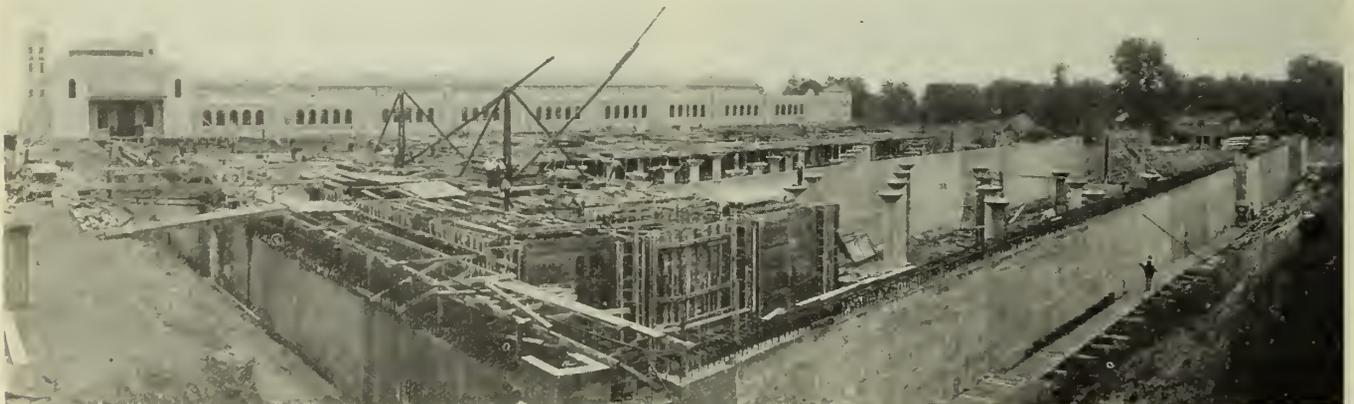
Northerly Elevation of Victoria Park Filter House, Mixing and Settling Tanks in Foreground.
